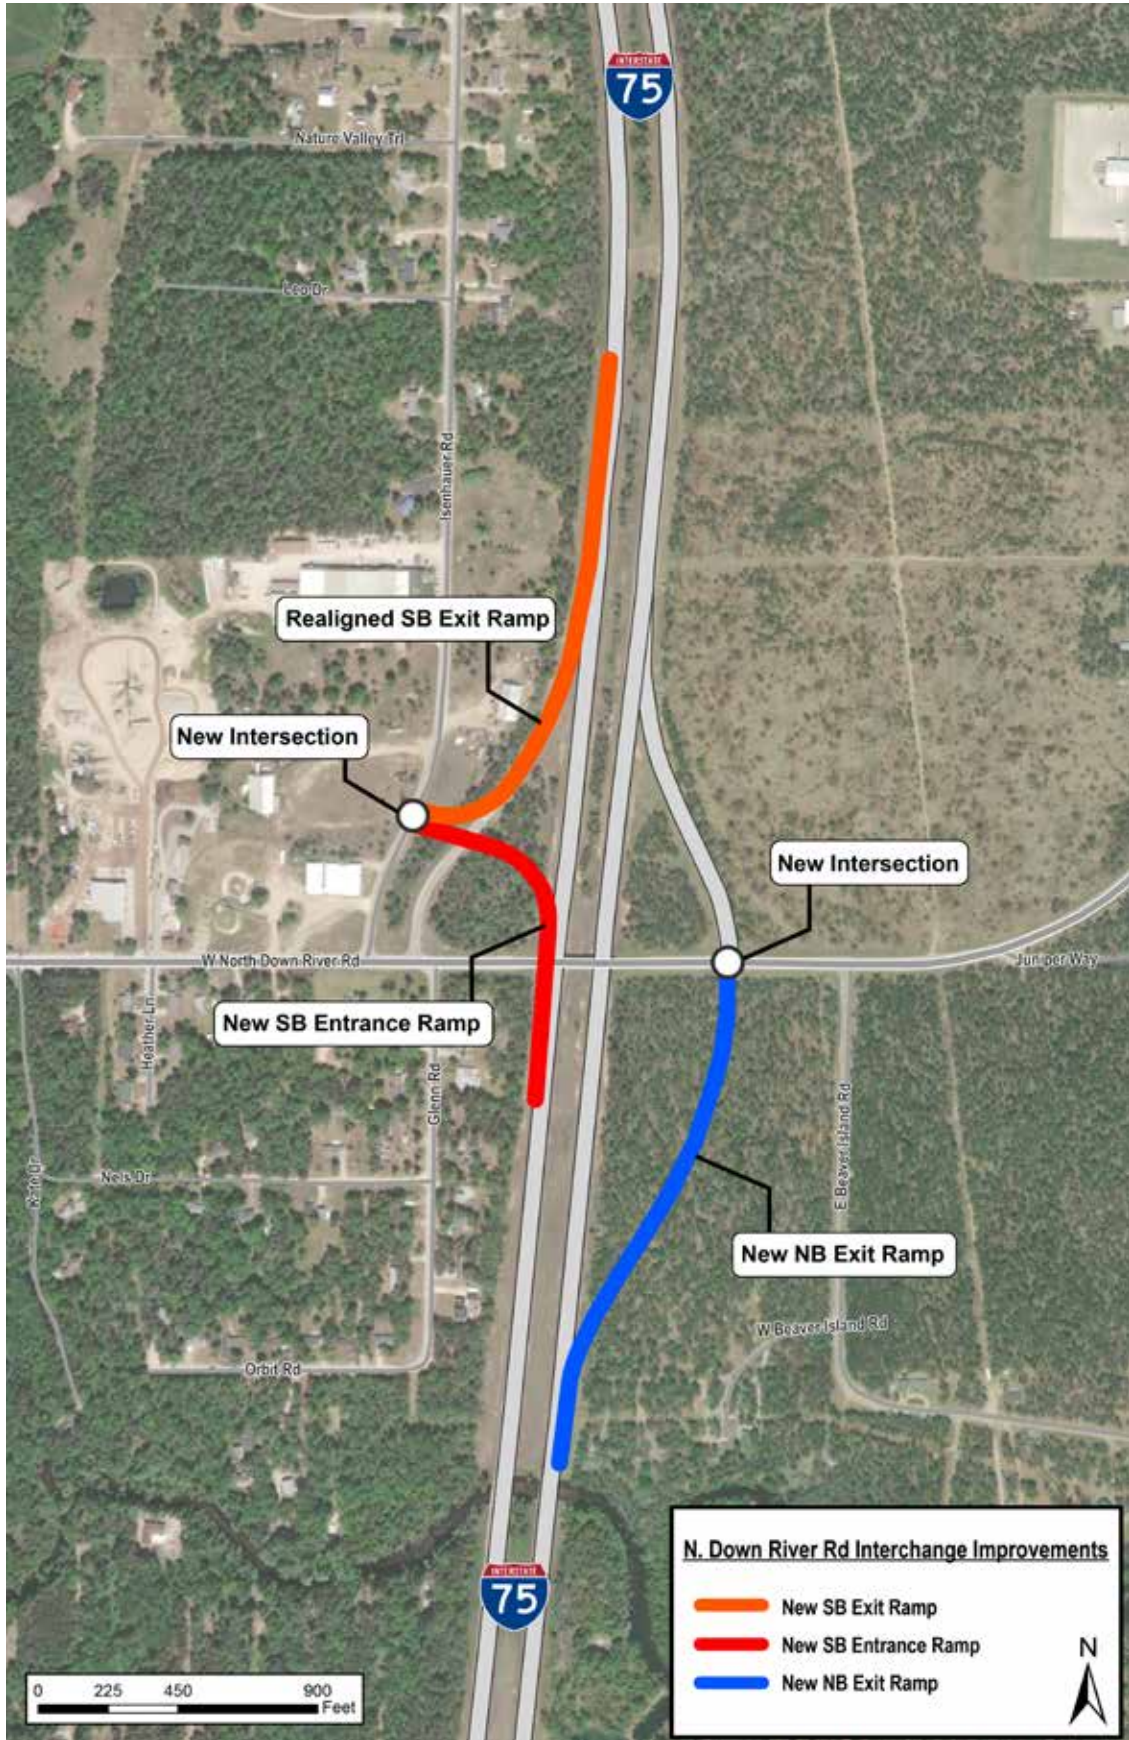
Recommended N. Down River Road Interchange Improvements
